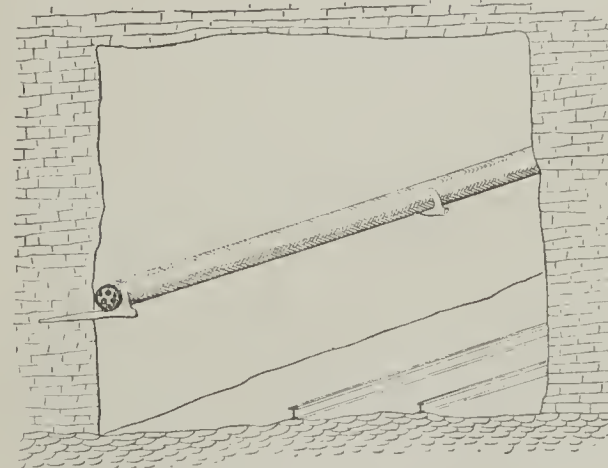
CABLES SUPPORTED BY HANGERS TO RIB
